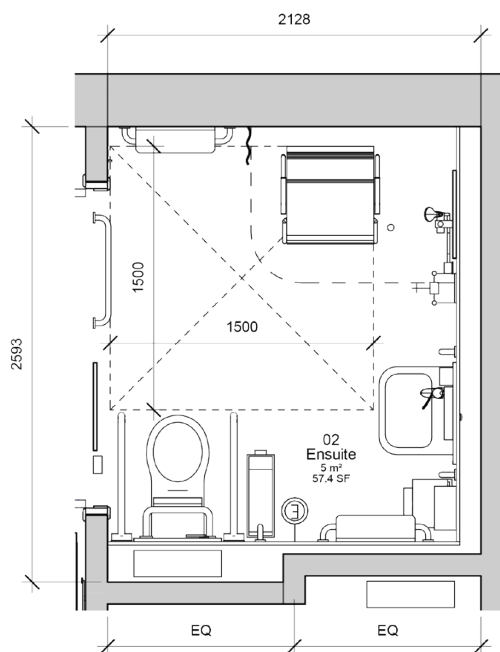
Nested En-Suite, Back-to-Back Arrangement (not to scale)
